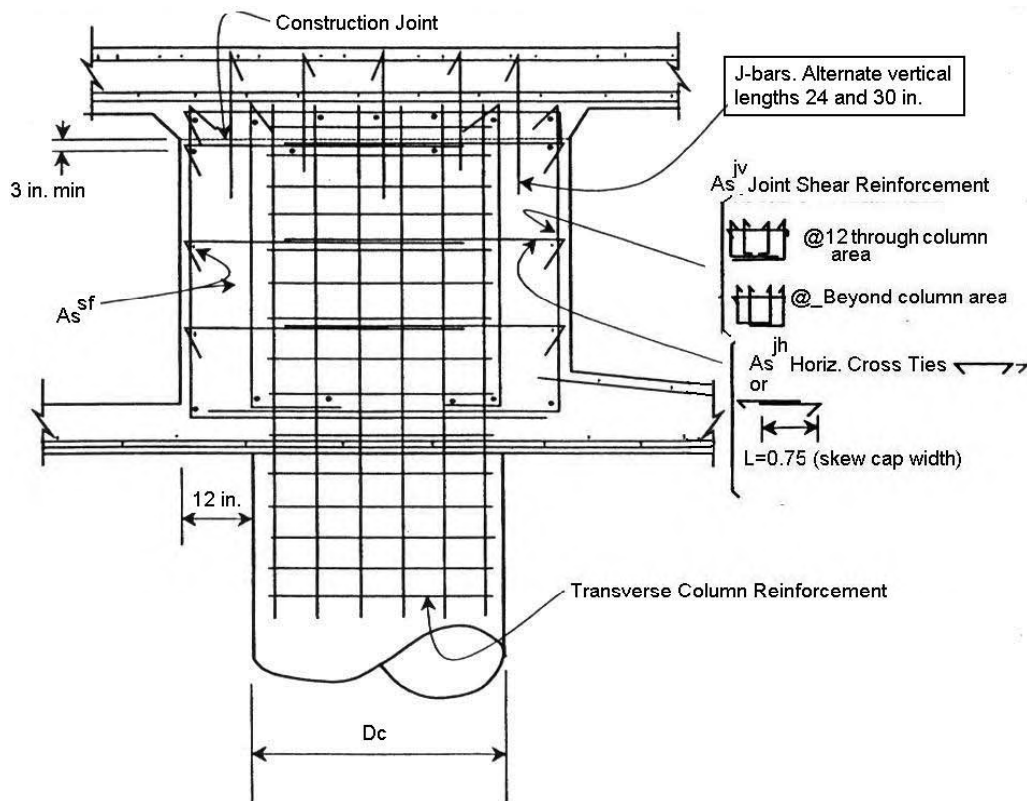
Additional Joint Shear Steel for Skewed Bridges
